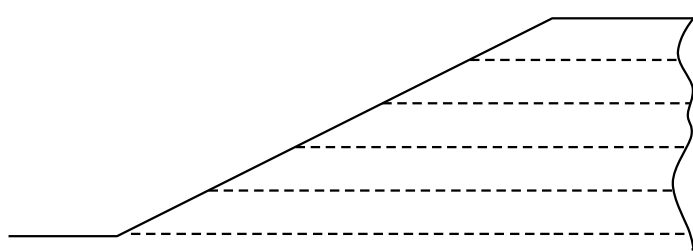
Reinforced soil with reinforcement truncated at slope face
